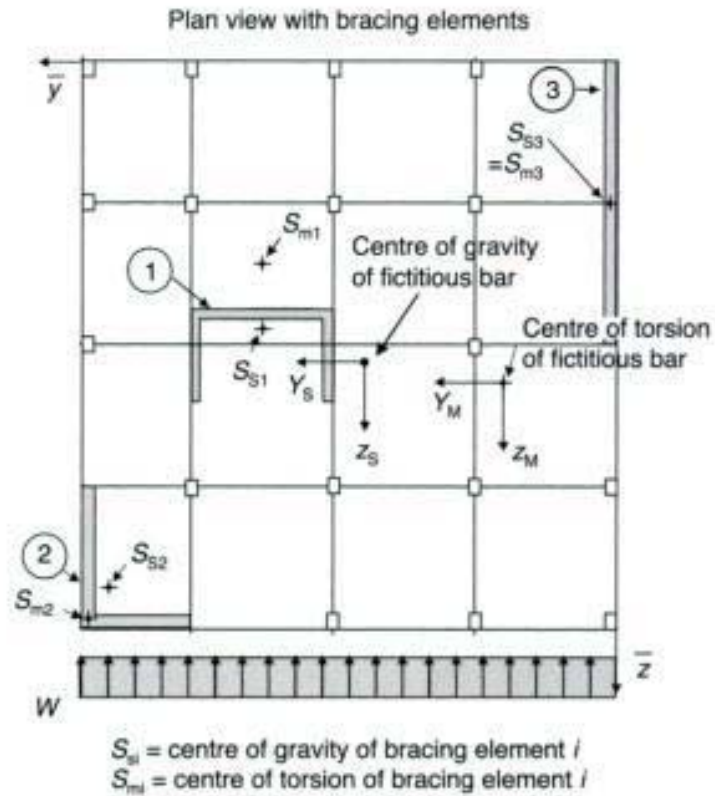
High-rise building – bracing system (Mainzer Landstraße, Frankfurt [16])
